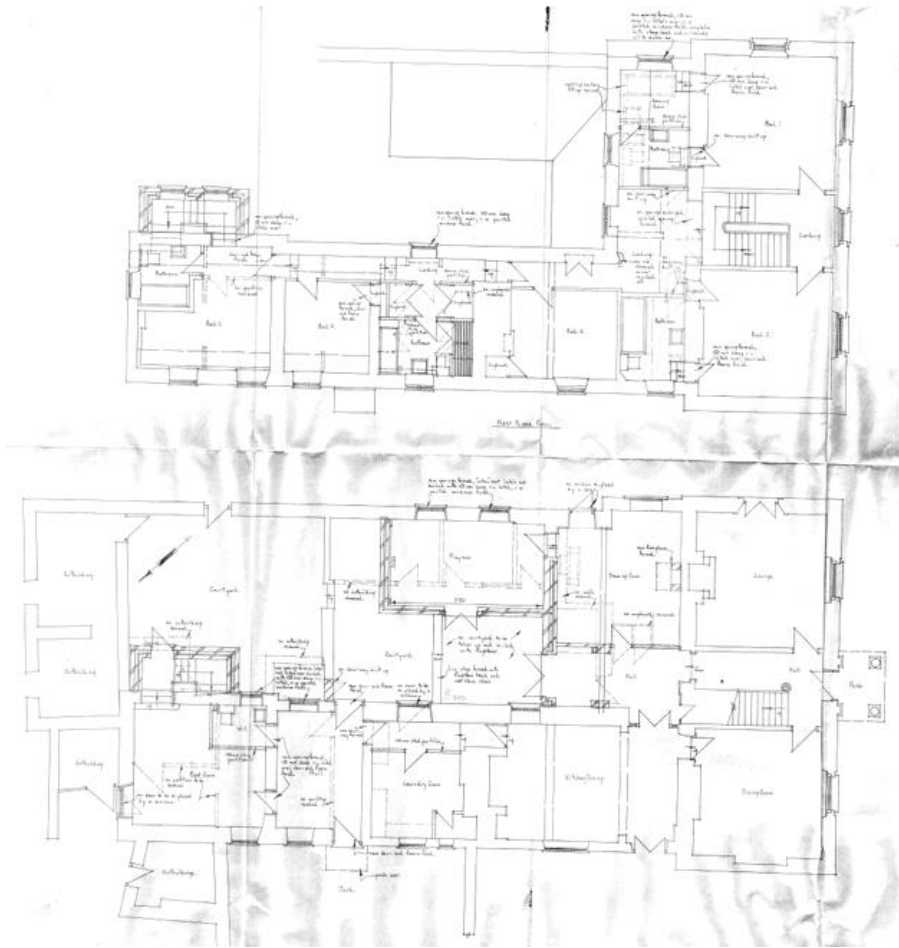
Proposed ground (bottom) and first floor plans from 110109/002 and 110109/003
